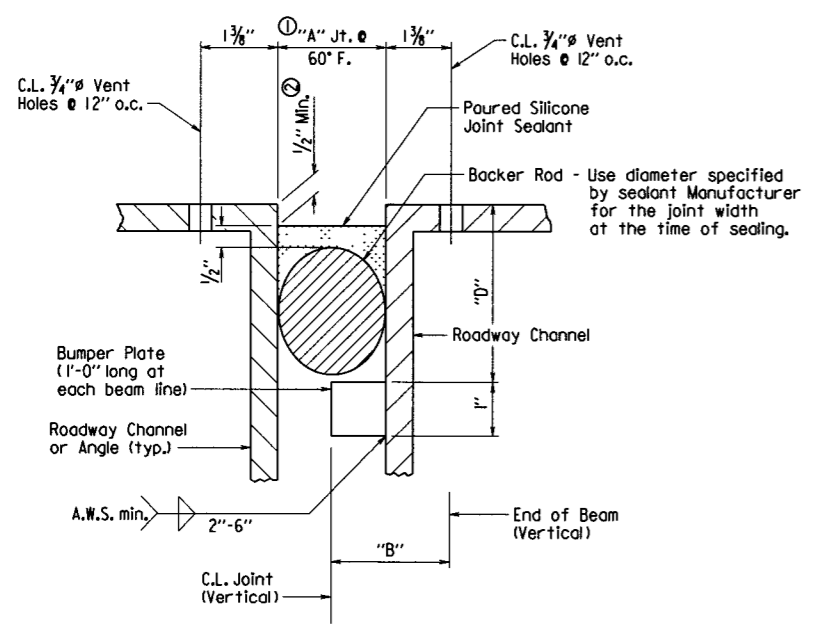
DETAILS FOR BLOCKING EXPANSION JOINT DEVICE
